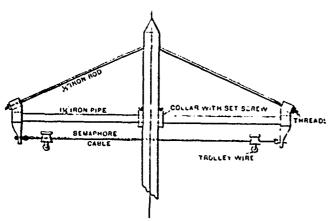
DOUBLE BRACKET CONSTRUCTION.
